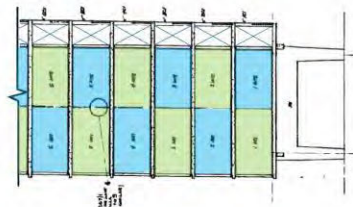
Typical elevation of apartment party wall (section taken in the west wing of the building looking towards the east). Note this is a panel detail which terminates at level 7, detailing indicated here continues to roof level
